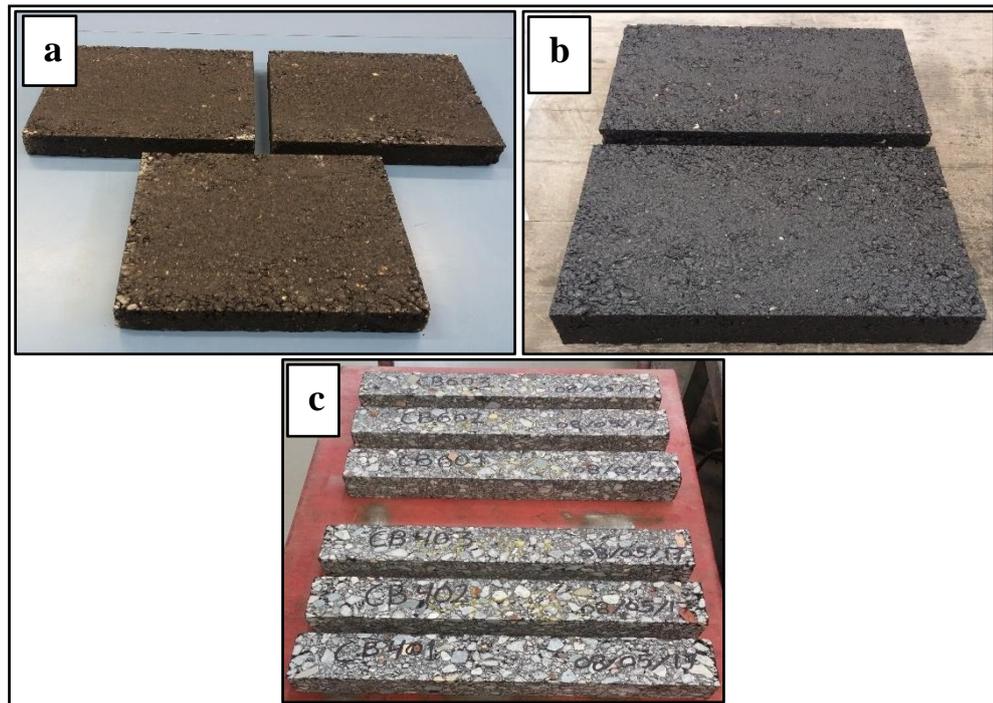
Prepared samples of (a) slabs for rutting testing, (b) slabs for fatigue testing and (c) beams for fatigue testing
